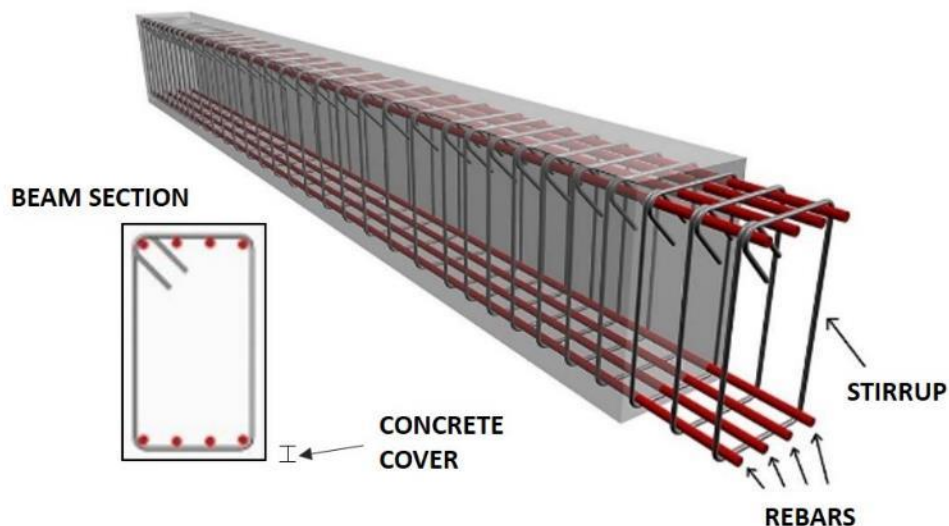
Schematic representation of stirrups and rebars in a reinforced concrete beam – Source: [1]
